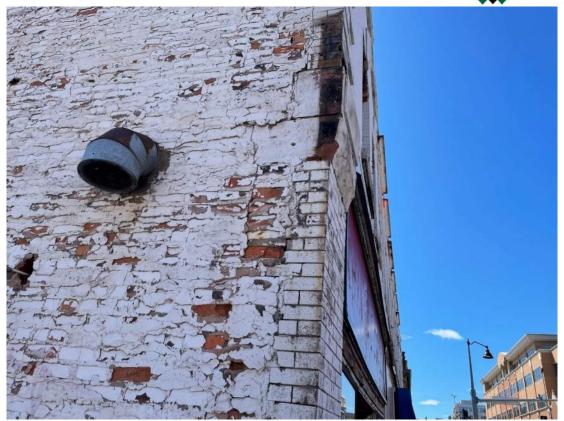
Existing East exterior wall looking west - close-up view of brick conditions
